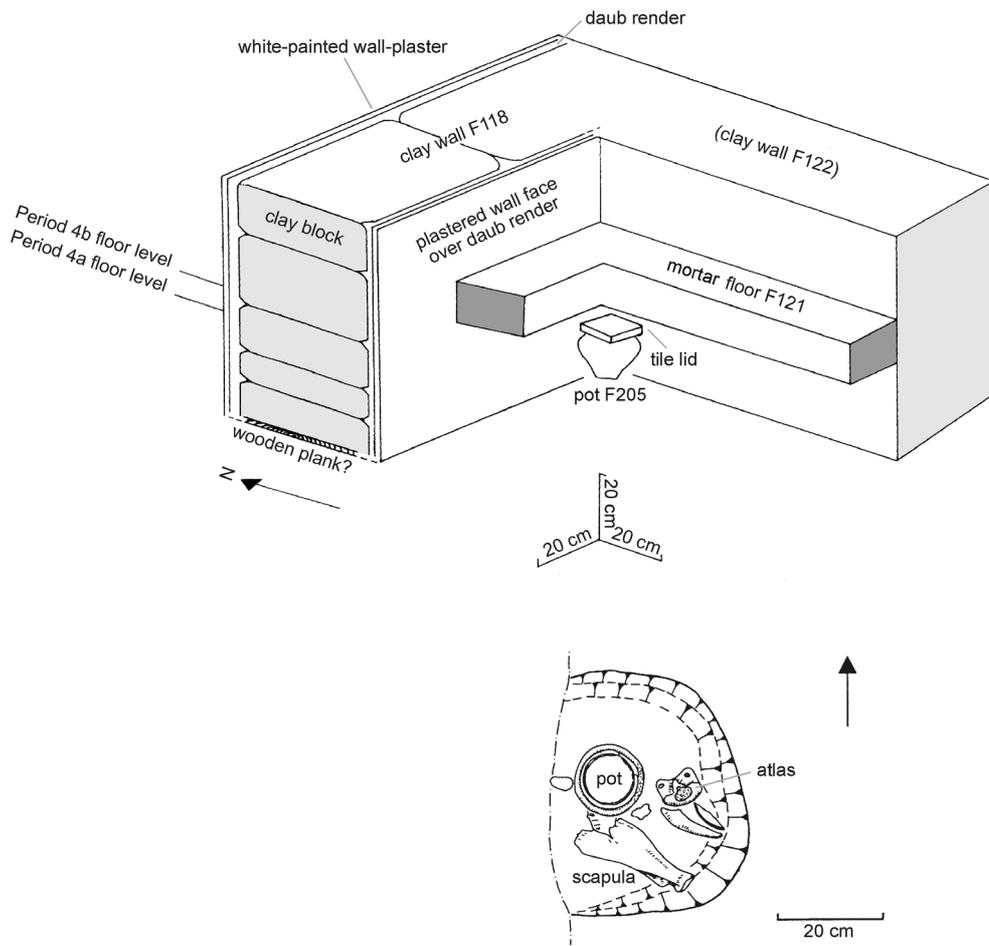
Reconstruction of clay-block wall F118 showing position of foundation deposit F205 under Period 4b floor F121 (left), and detail of foundation deposit F162 (right).
